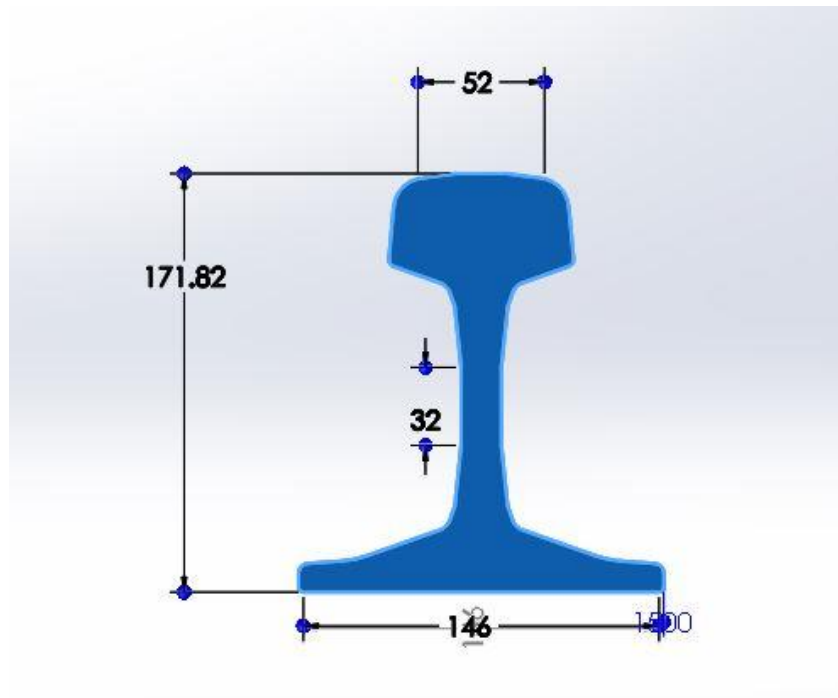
UIC60 railway track profile (Dimensions in mm)
